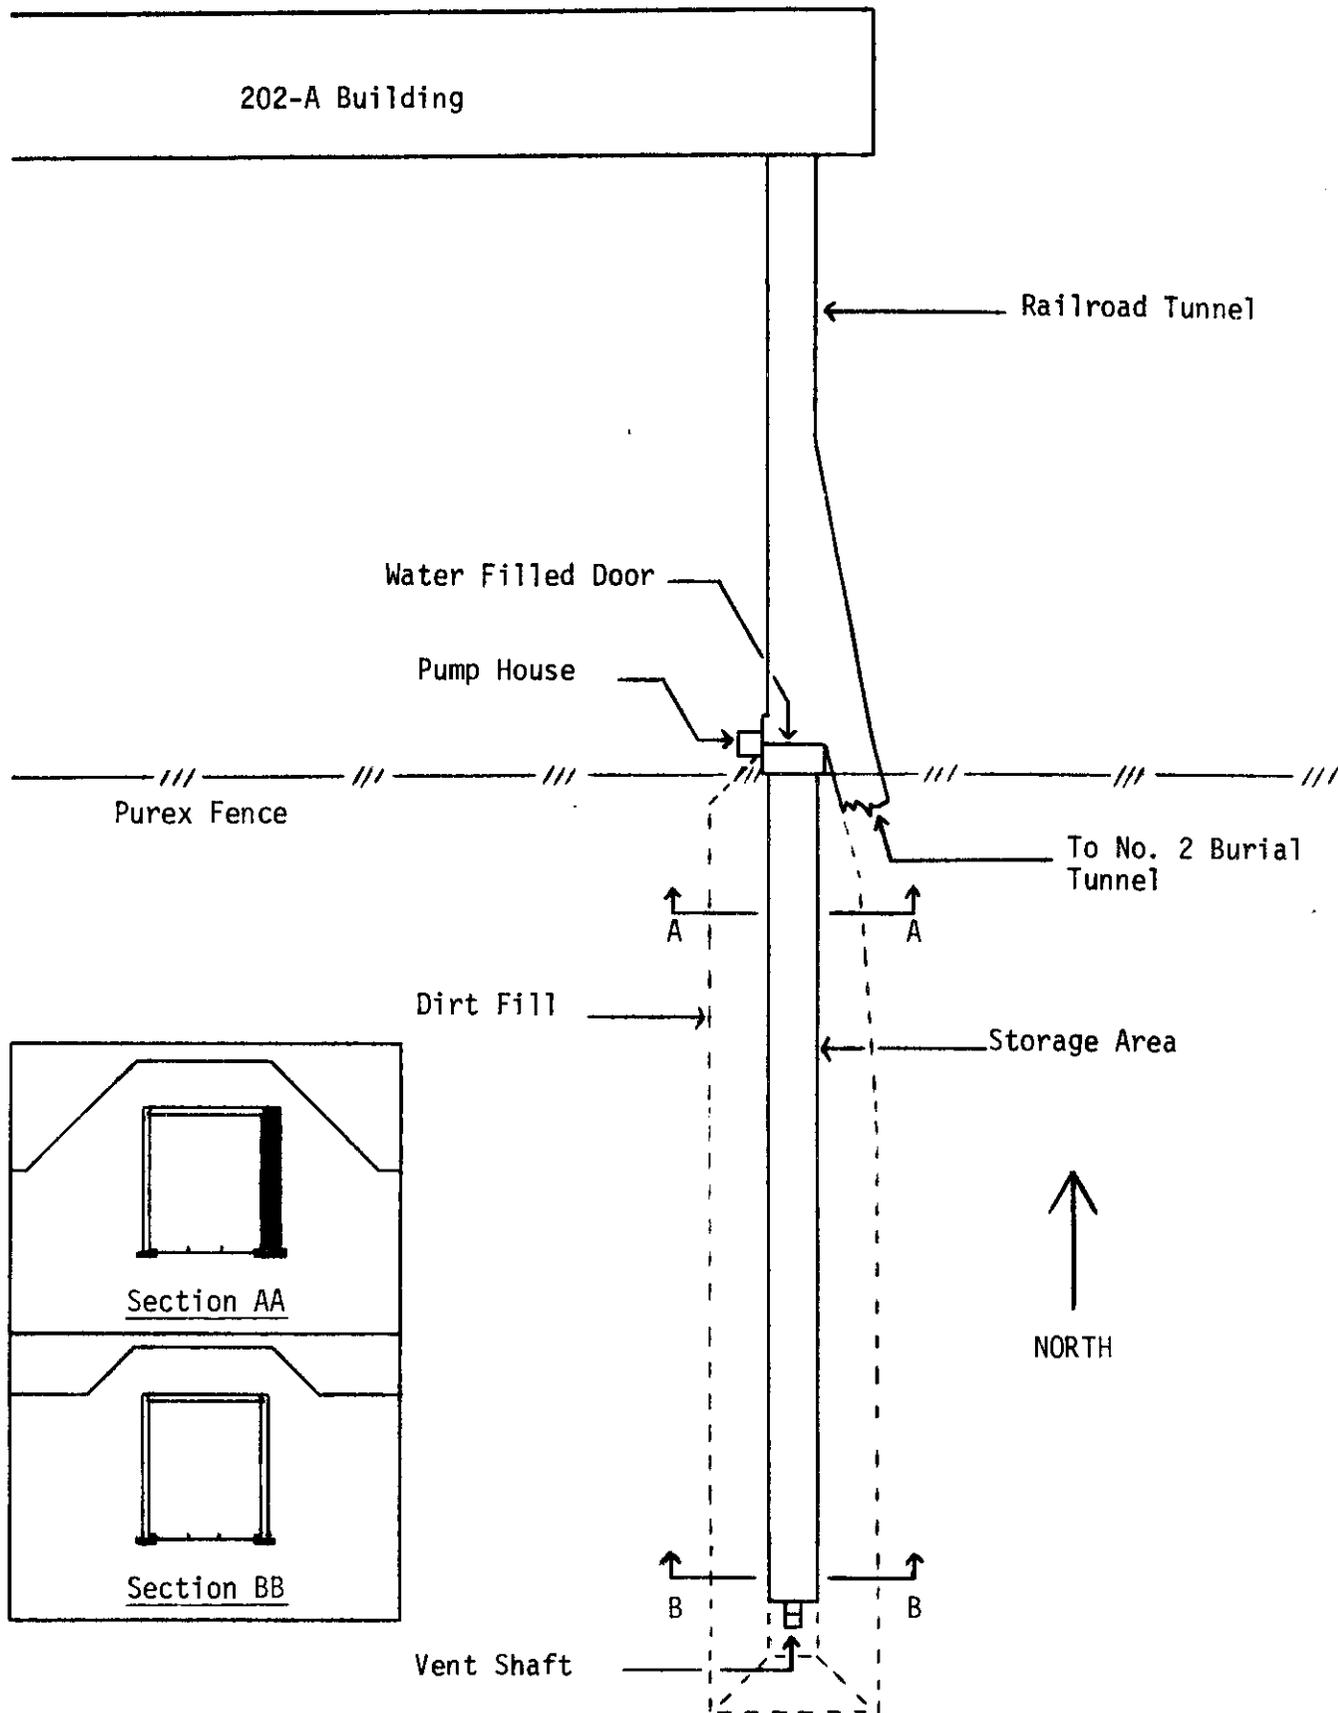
PUREX NO. 1 BURIAL TUNNEL - PLOT PLAN
